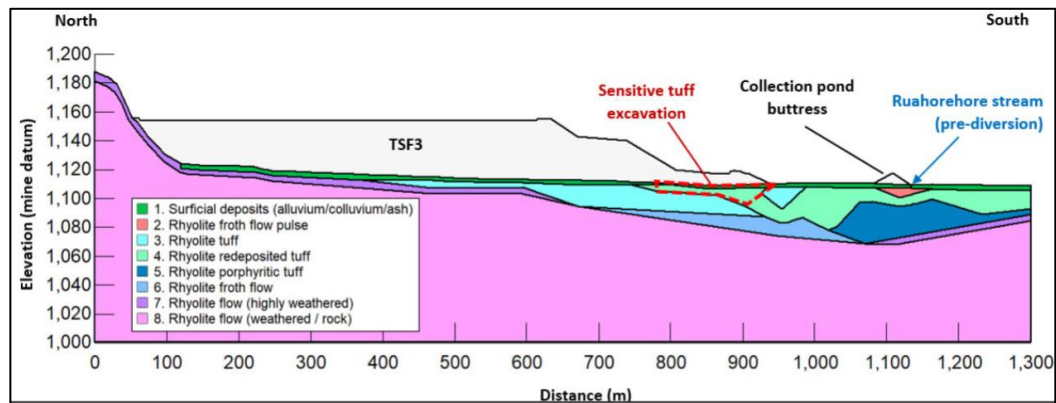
Northeast-southwest cross section of paleo-gully beneath the TSF3 site (GHD, 2025d)
